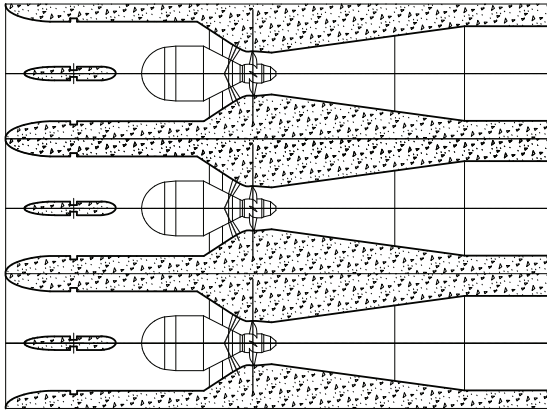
Plan of the powerhouse – Bulb turbine.
